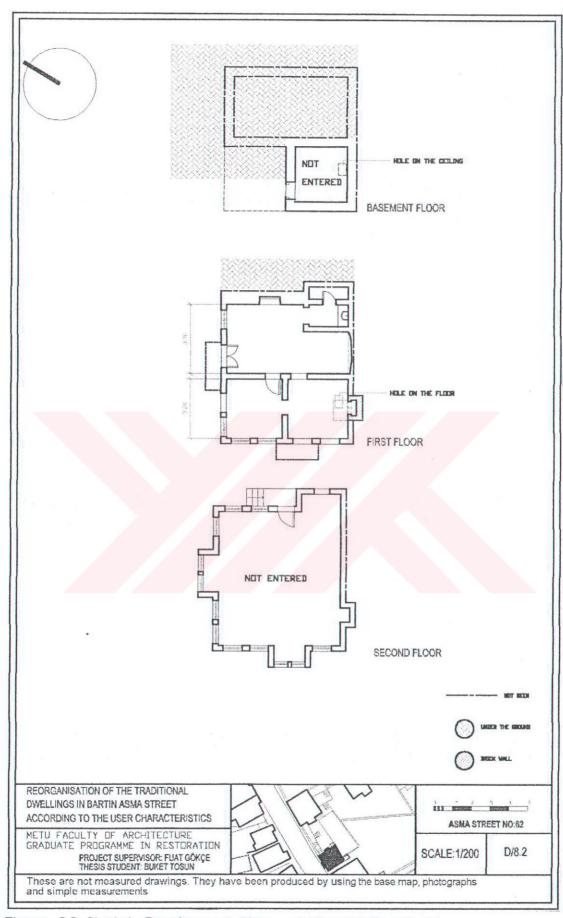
Sketch Drawings of Plans of The Building No:62
